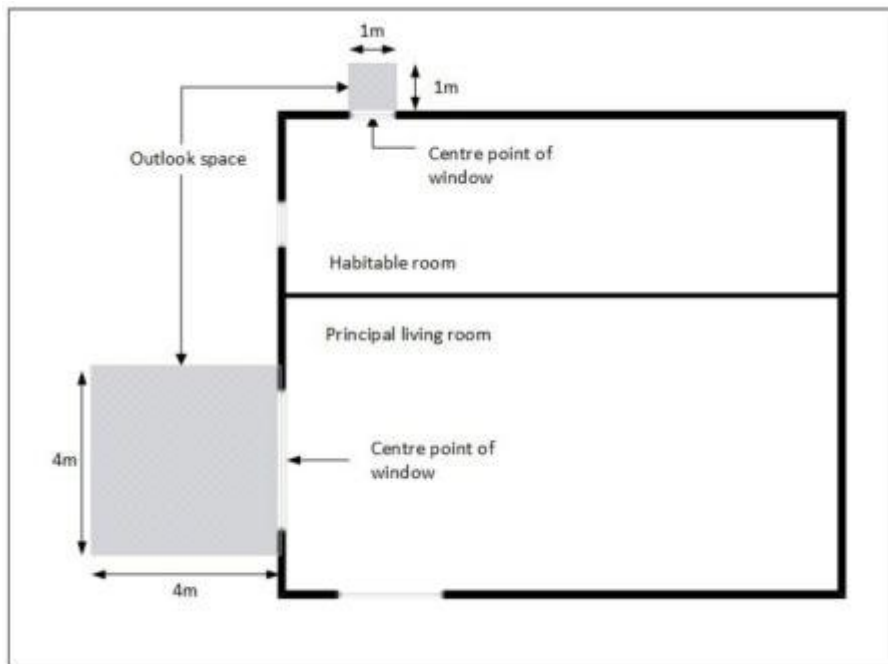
outlook space requirements for development containing up to three dwellings (H5.6.12.A1 & H6.6.13 A1)
